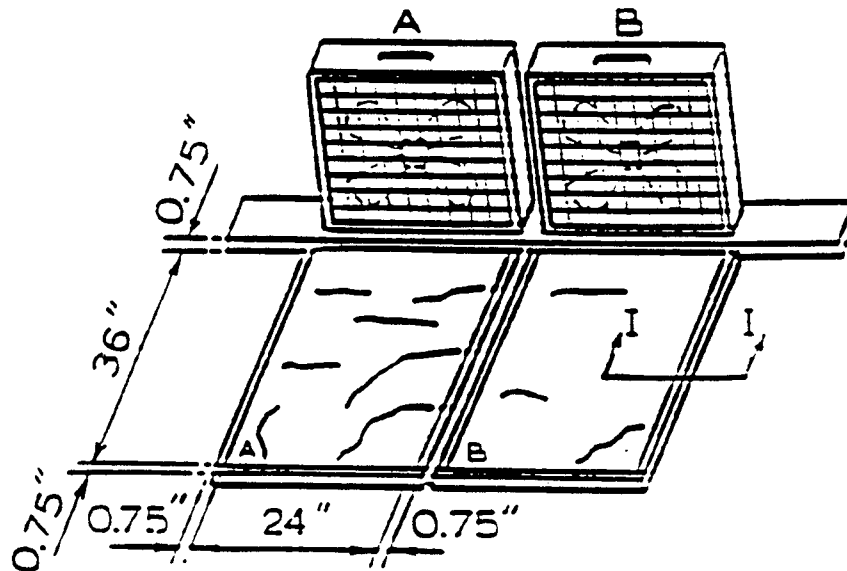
Method 3 - Constrained Plate Specimen (Shaeles et al. 1988)
